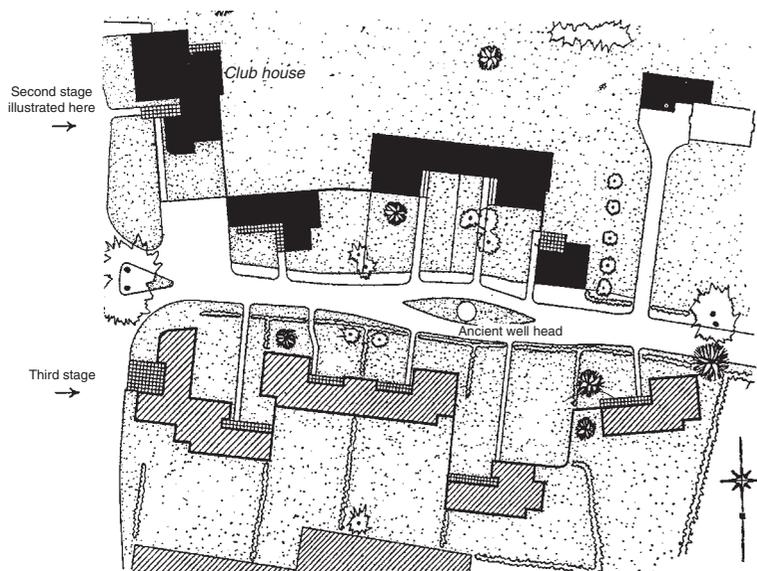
Rushbrooke: site layout plan of Phases 2 and 3 of the redevelopment (plan by Llewelyn-Davies Weeks, redrawn with approval from AR, 2/60, p. 118–120).
